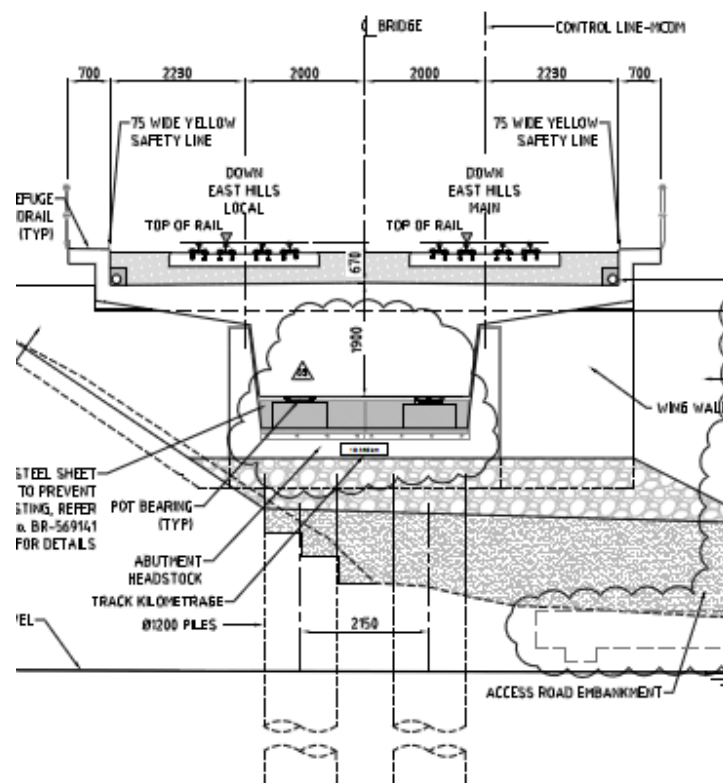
Cross-section 2 of the Salt Pan Bridge.
